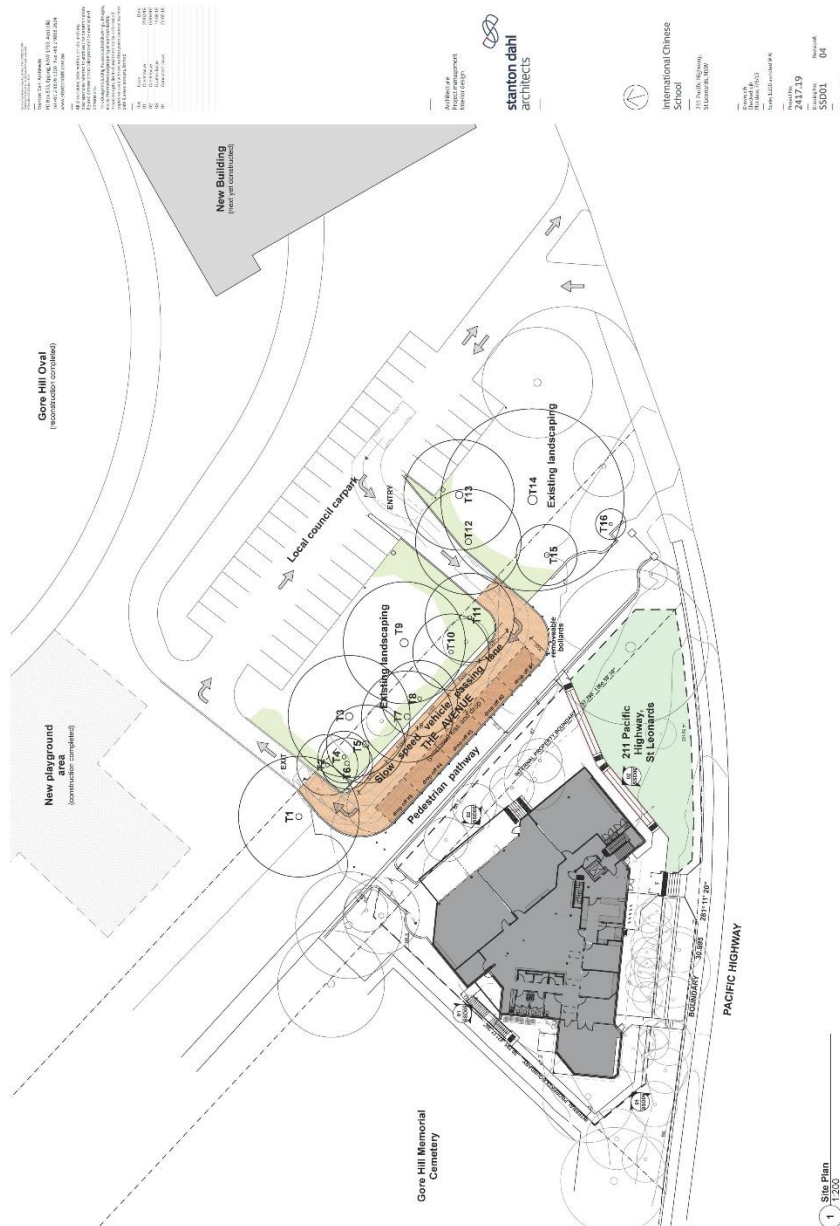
Current site plan for the proposed new building and drop off/pick up area for parents and students (plan view).
